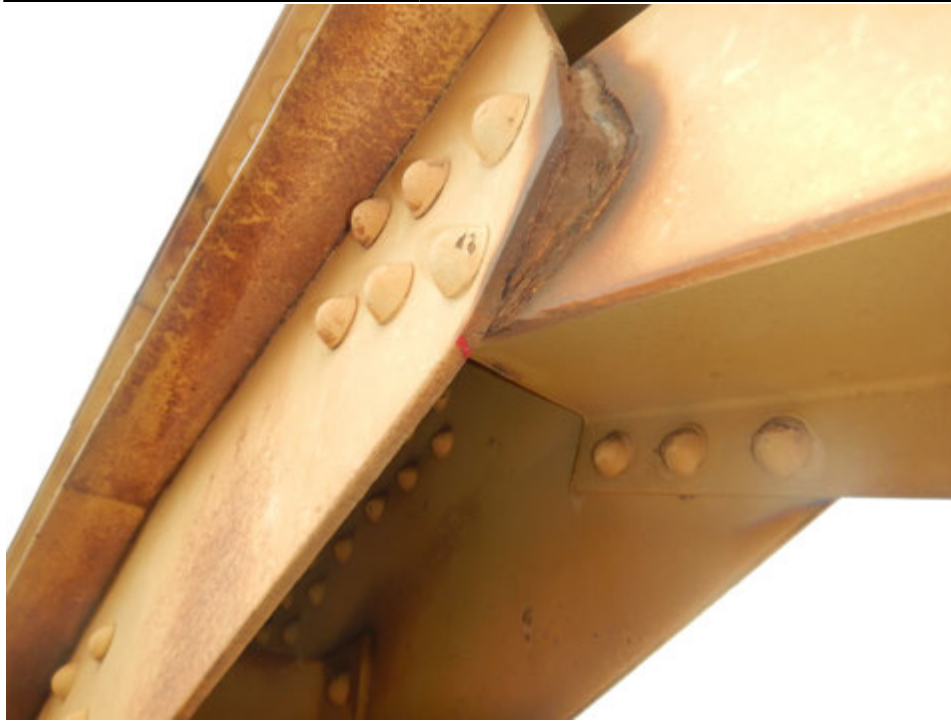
Looking southwest at the inboard gusset plate at west U1, span 37. Note: two sheared rivets at the connection for U1L1. A 5/16-inch long crack exists in the bottom edge of the gusset plate near the connection rivet for U1L2.
